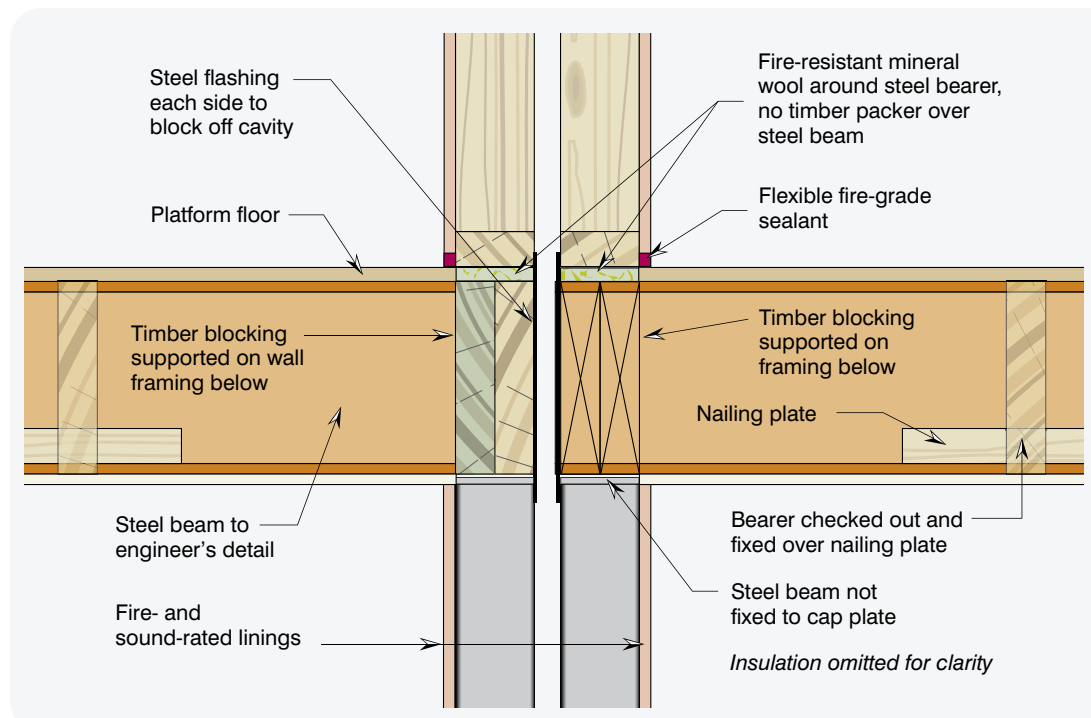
Details of the steel beam pocket in timber-framed separation wall – elevation view.
